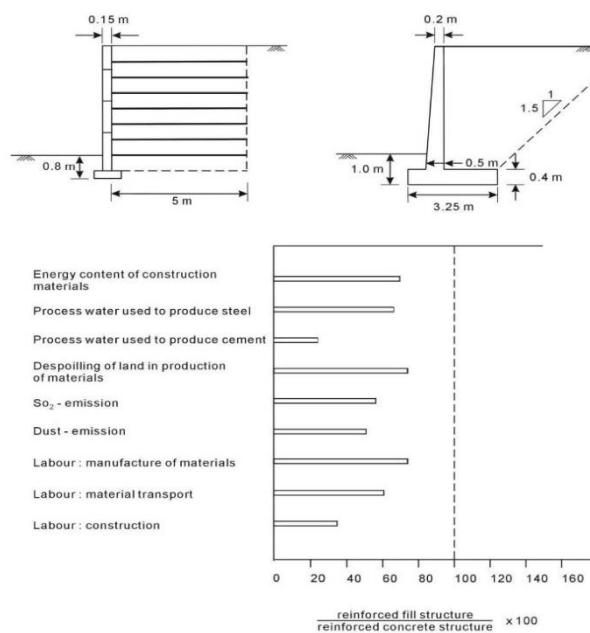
Ecological Parameters for a 6m High Reinforced Earth wall and an equivalent Reinforced Concrete Retaining Wall
